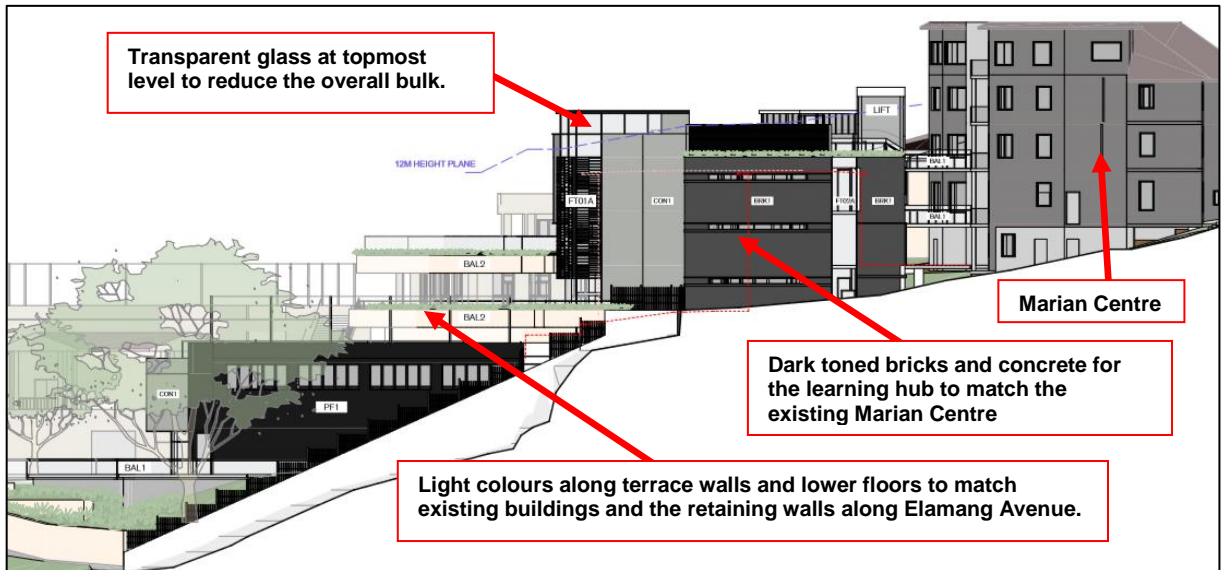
Stage 1 materials and finishes (west elevation) (Source: Applicant's EIS)
